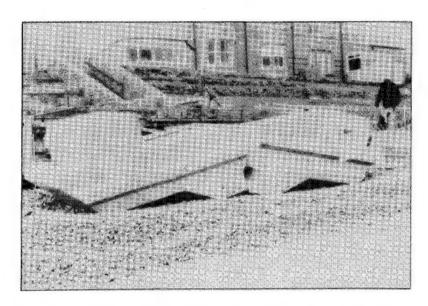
Precast units for lower berm, Newbiggin-by-the-Sea (from Barfoot 1988)
